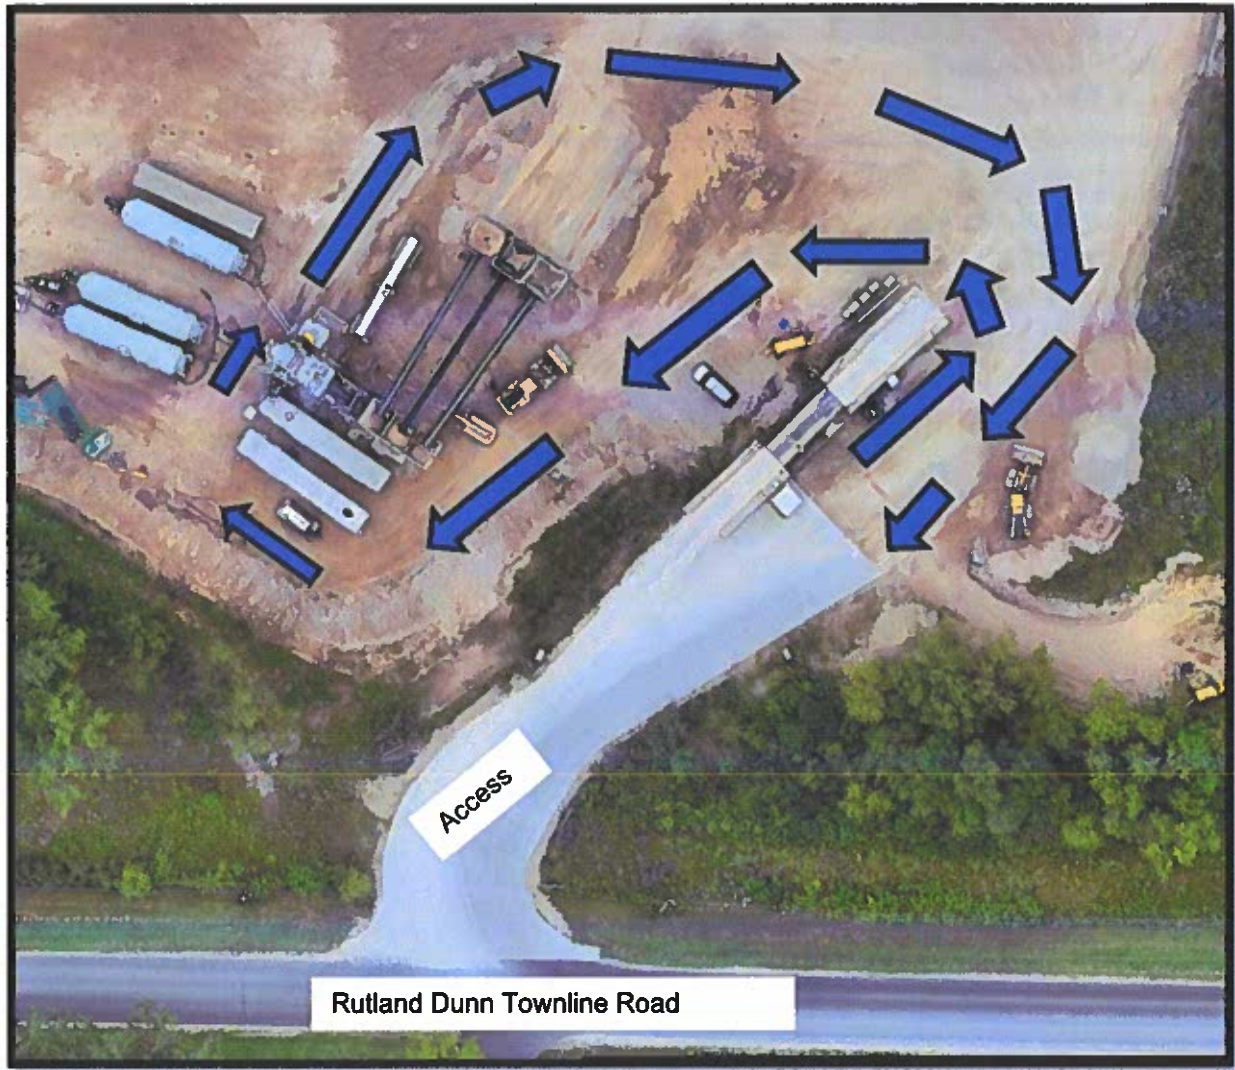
SECTION FROM MICHELS SITE PLAN
